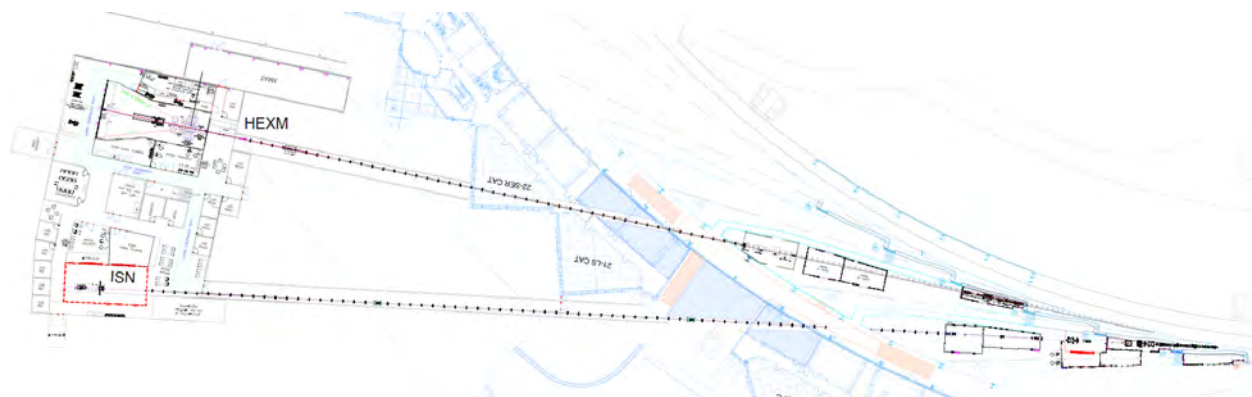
Location of the ISN instrument. The instrument will be located at 220 m from the source in a new shielded enclosure (marked ISN in drawing).
